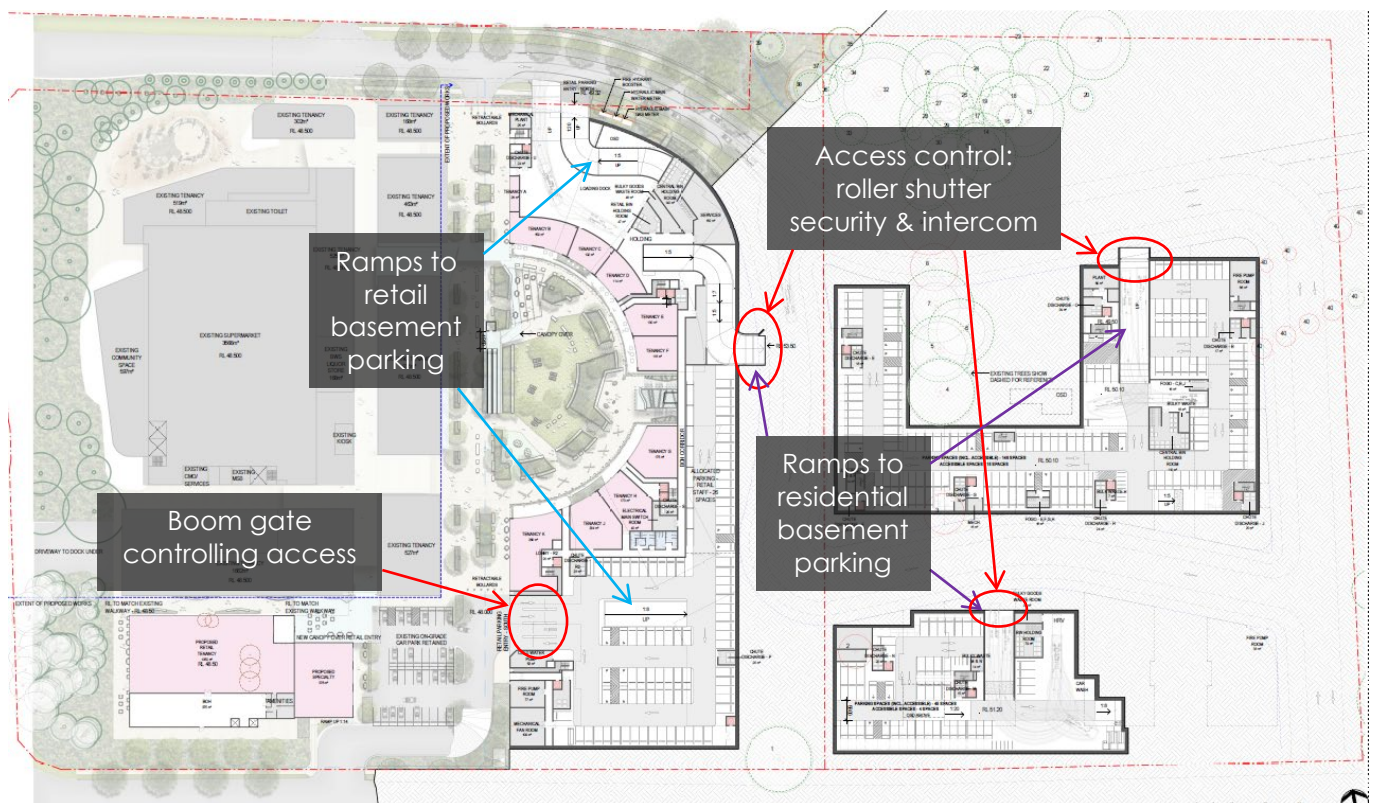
Extract from GA Plans [RL 50.70], showing car parking (Source: Group GSA, 2025)
